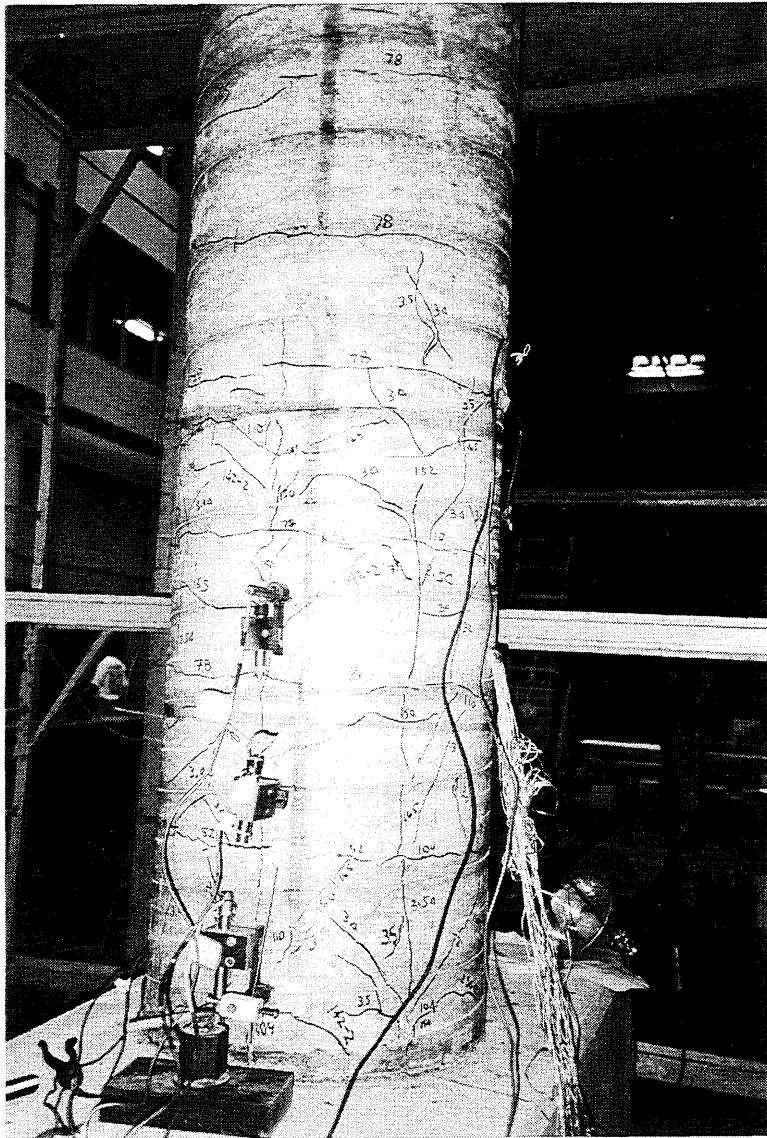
Cracks on Tension Face for Positive Loading
